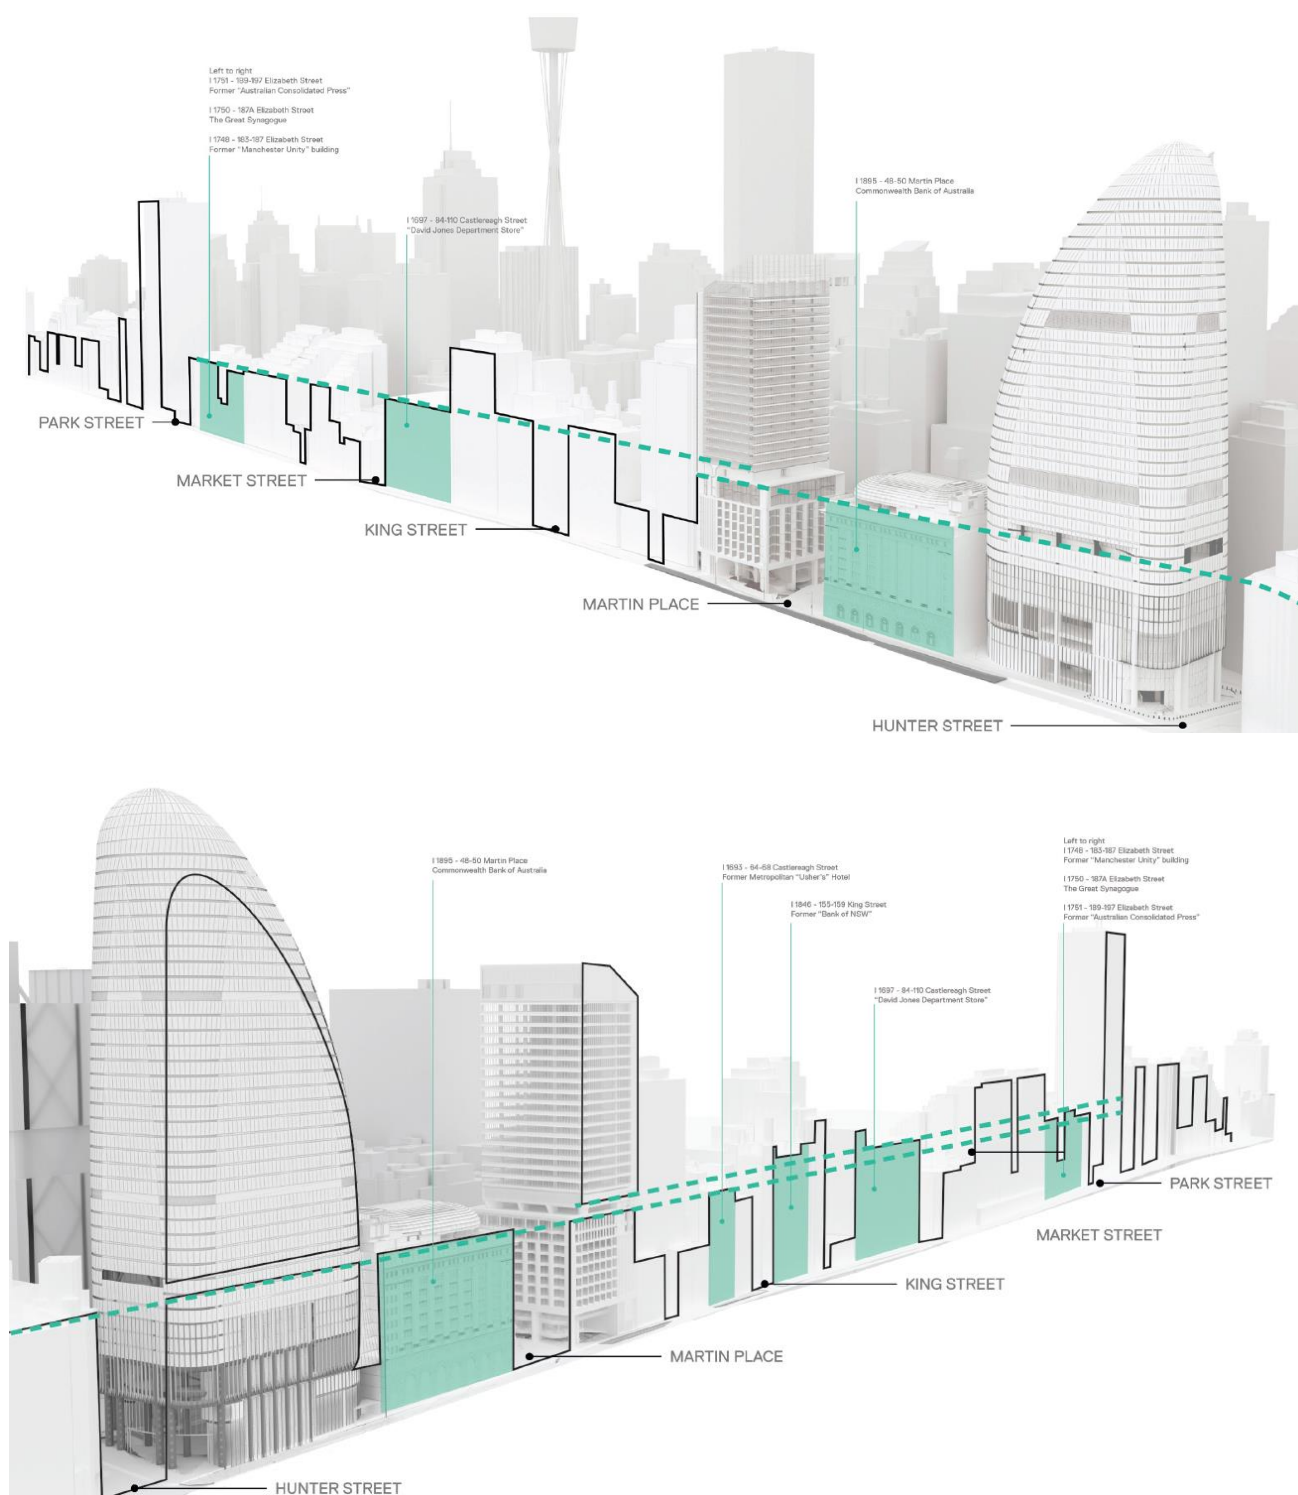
Street frontage heights datums on Elizabeth Street (above) and Castlereagh Street (below)
